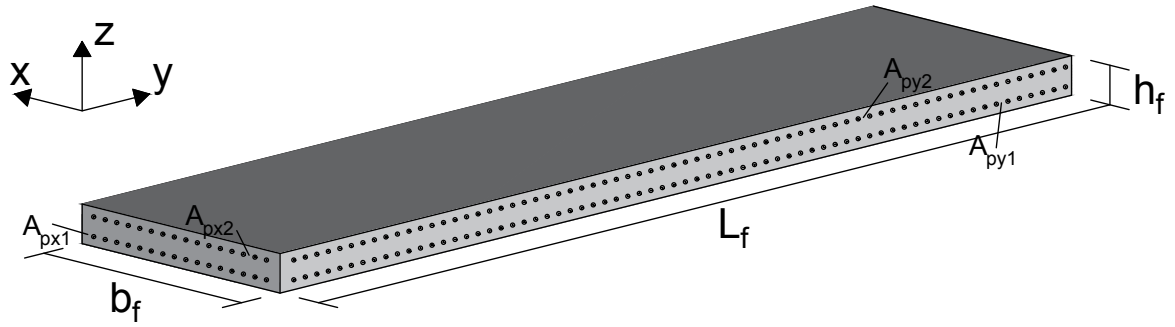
Massive floor girder design with directions and indicated prestress cables
